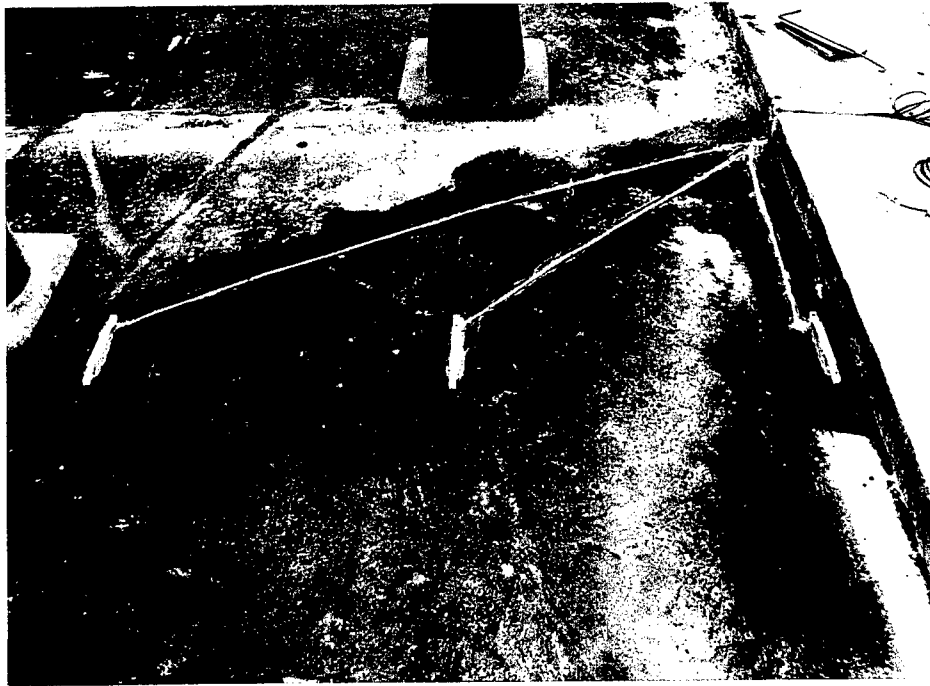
Asphalt Surface and Concrete Embedment Gages Prior to Concrete Placement
